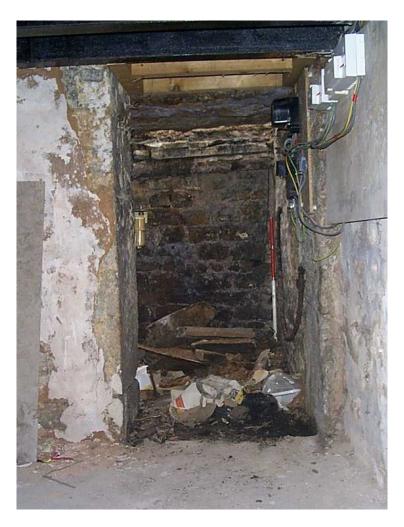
52 Church St. entrance into cellar through principal façade > south-west
